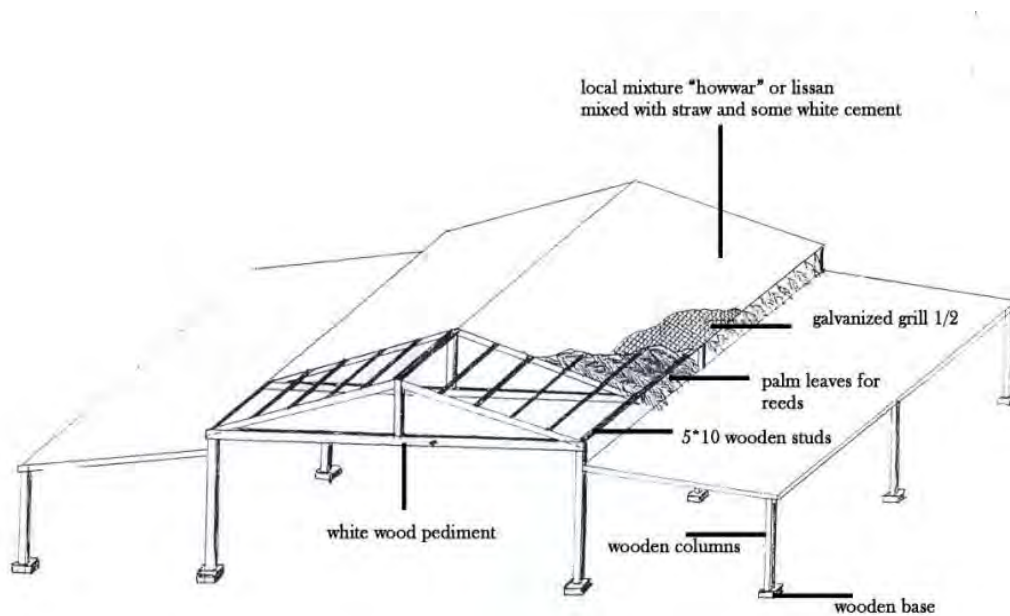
Details of the protective shelter over the upper Basilica within the complex of St John the Baptist
